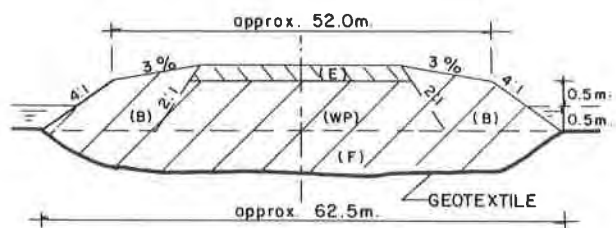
CONSTRUCTION OF BERMS AND EMBANKMENT
